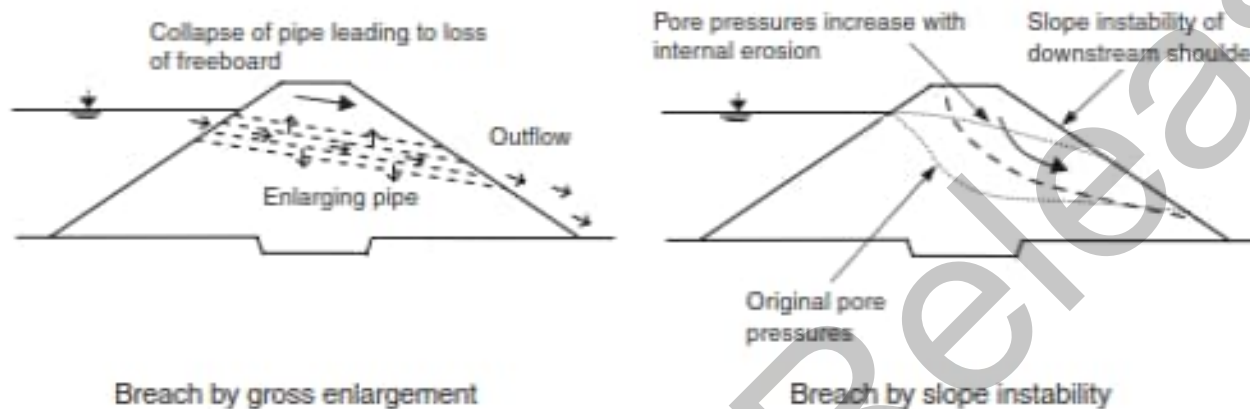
Potential breach (failure) phenomena-pipe enlargement and slope instability.
